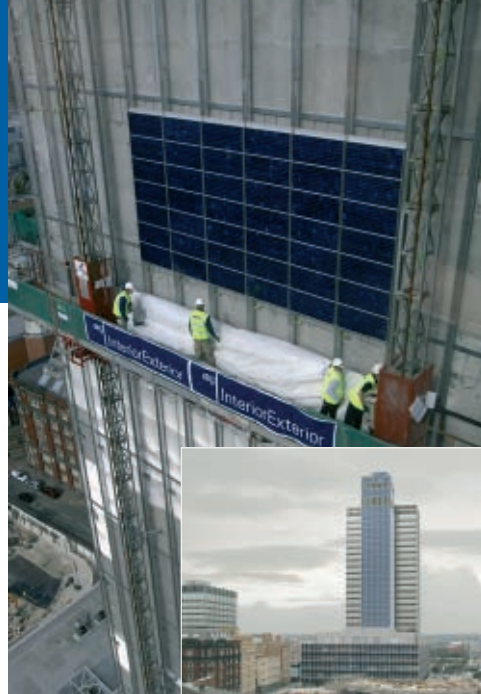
The 391 kW PV system on Manchester's CIS building will be Europe's largest vertical solar façade.
